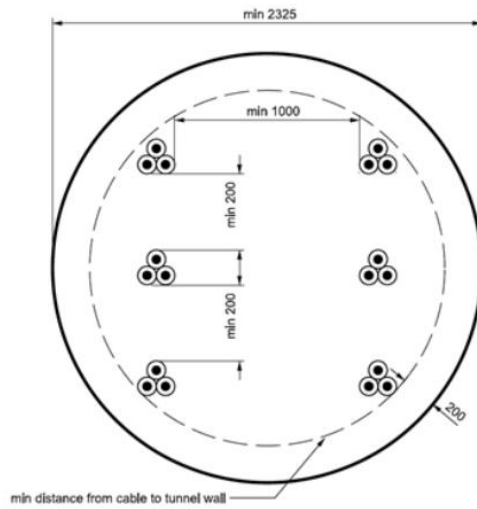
Typical Tunnel Layout, Dimensions and Cable Layout for cables in trefoil
